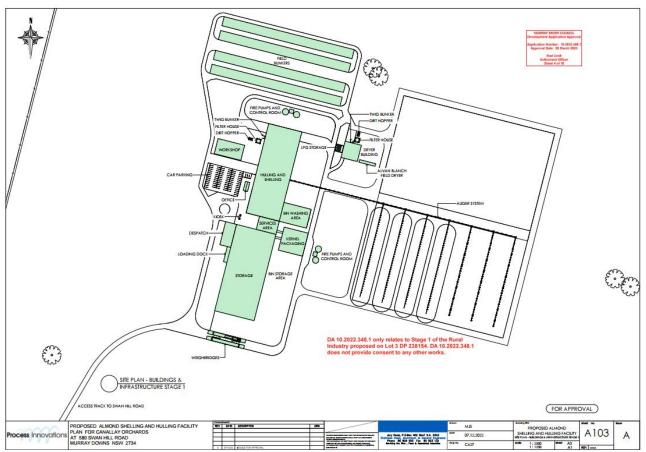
Approved Development Site Plan (JMA Engineering, 2024)
